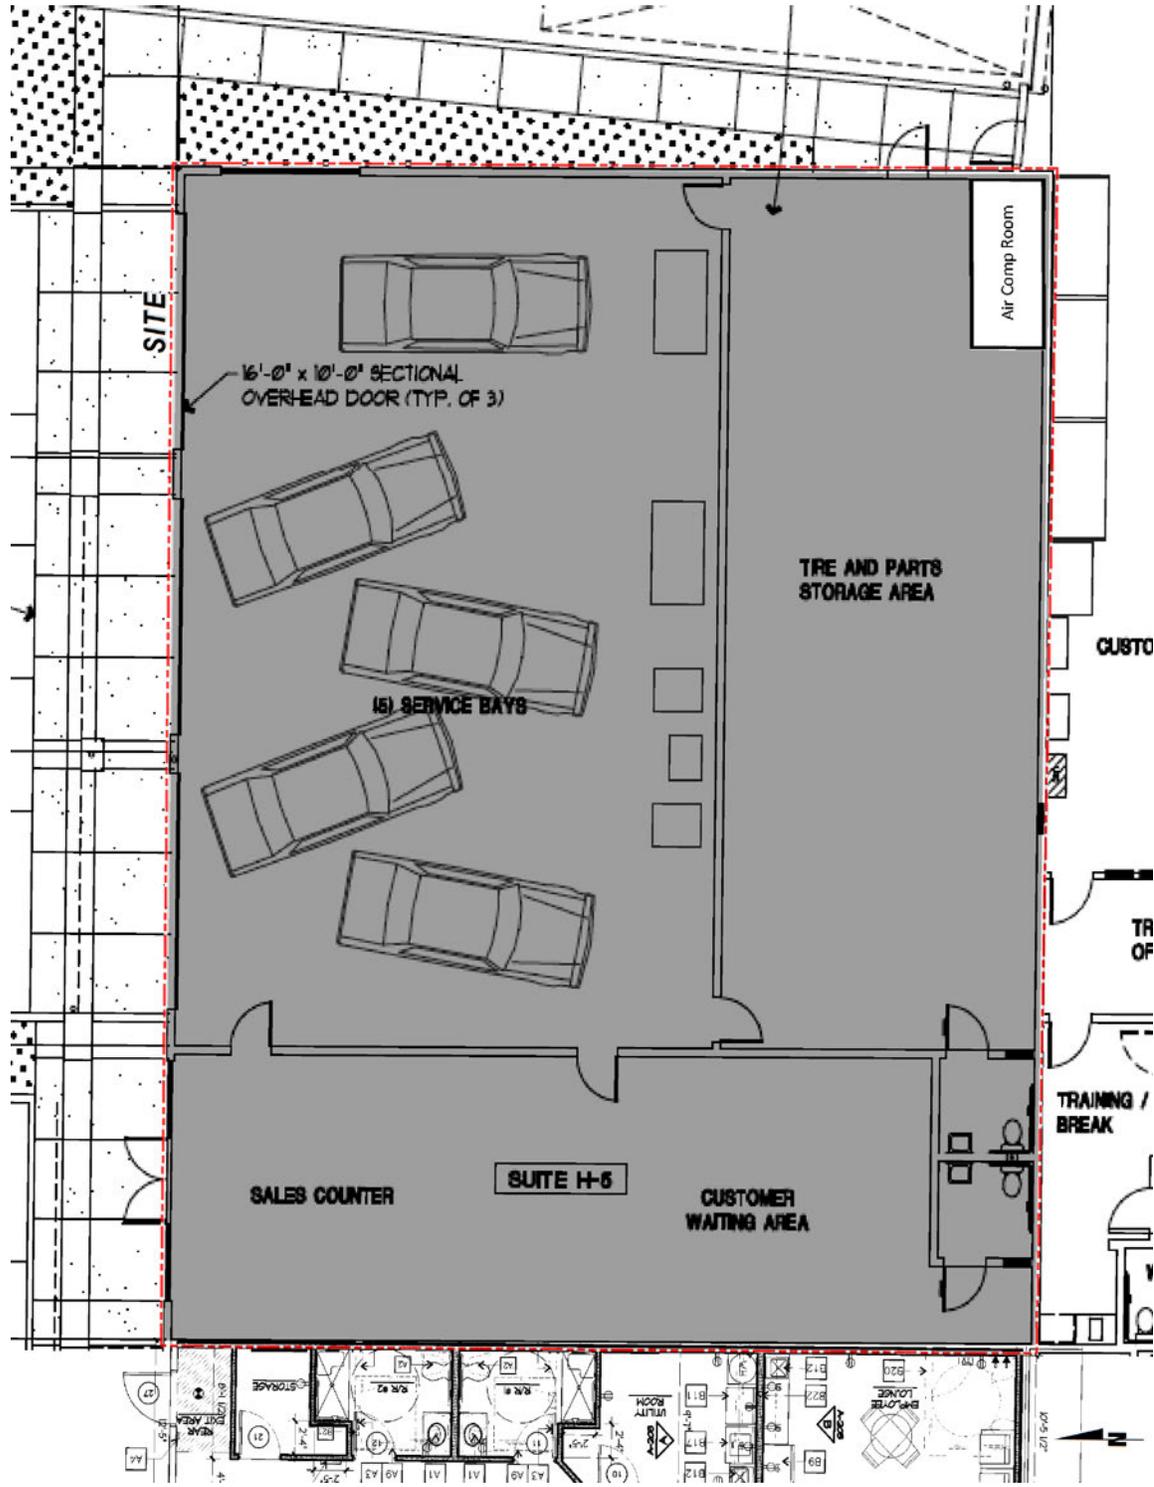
C: DISCOUNT TIRE CENTER SITE PLAN
